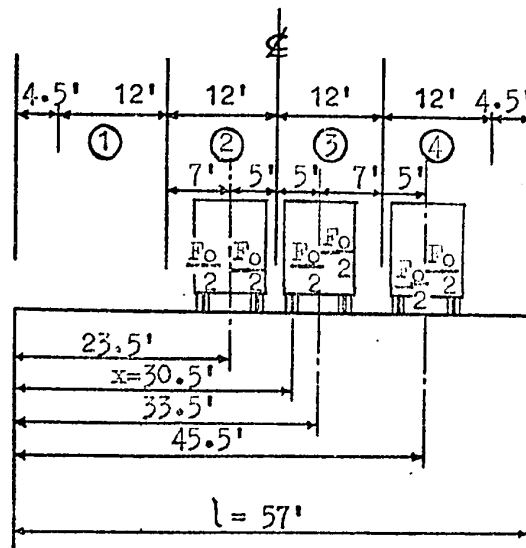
LOADING USED IN THE COMPUTATION OF THE MAXIMUM L.L. MOMENT IN FLOOR BEAM
